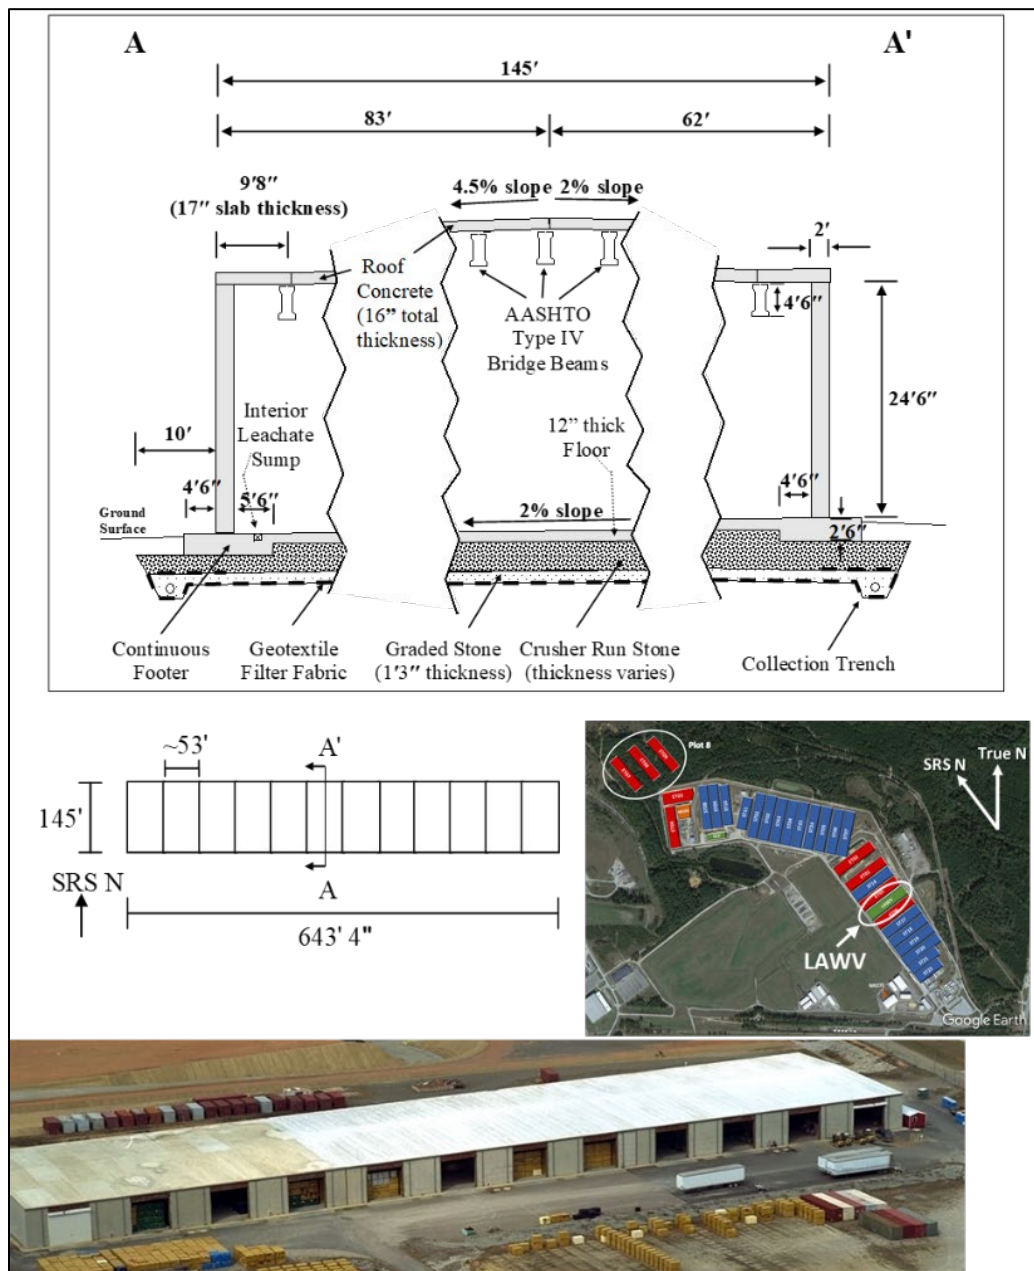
Low-Activity Waste Vault Cross-Sectional (A-A') and Aerial Views (WSRC, 2008)
